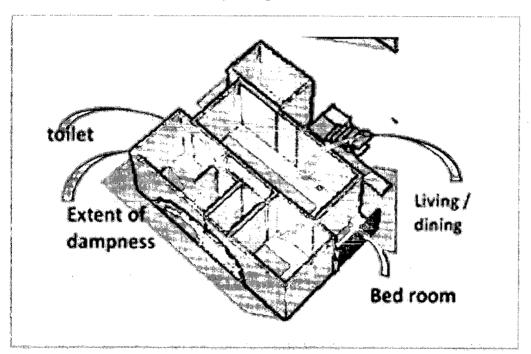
showing location of toilets, and extent of dampness in a residential building
